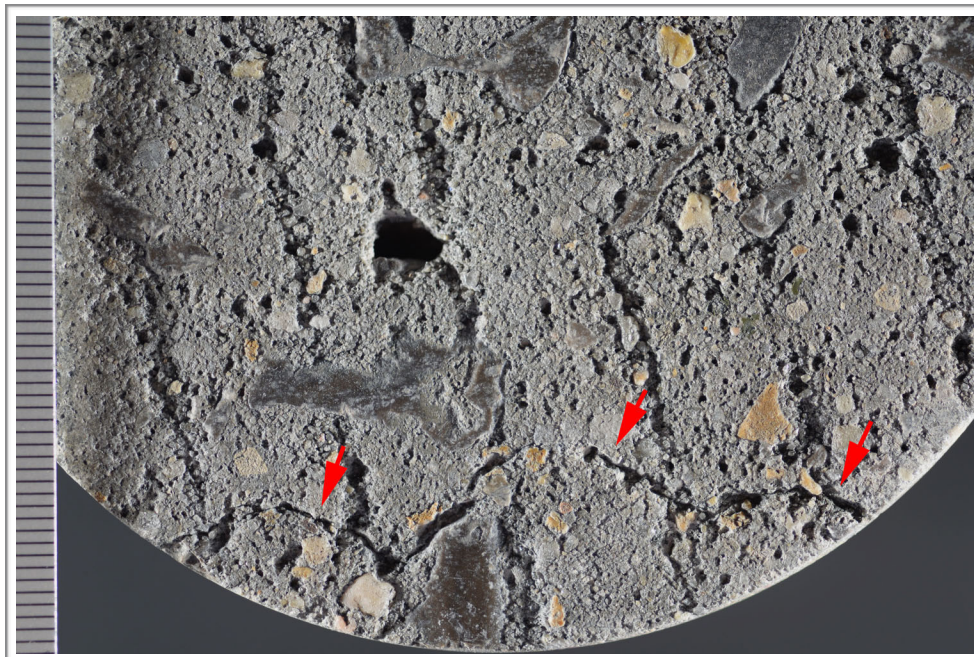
Photograph showing crack (red arrows) on the top surface; scale in millimeters.
